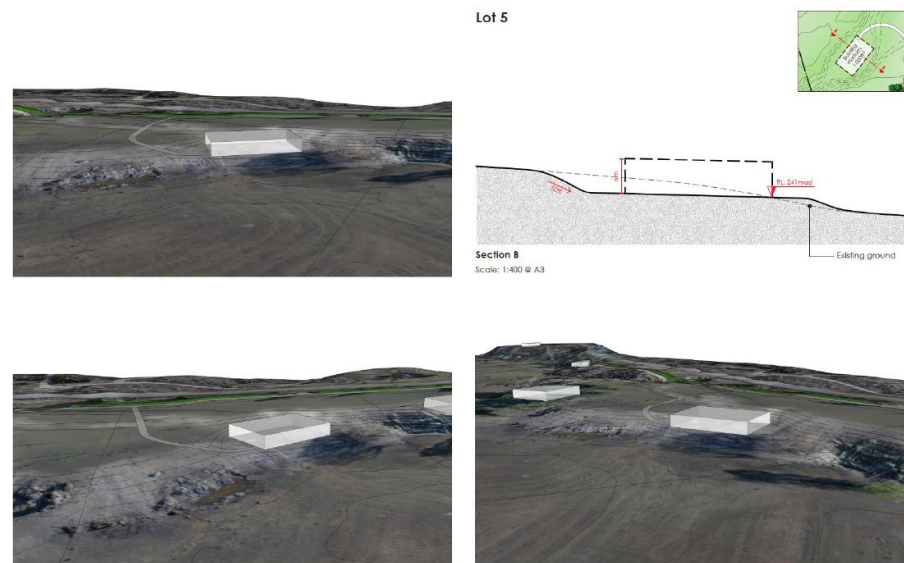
Patch Landscape Plan Lot 5 Building Platform
